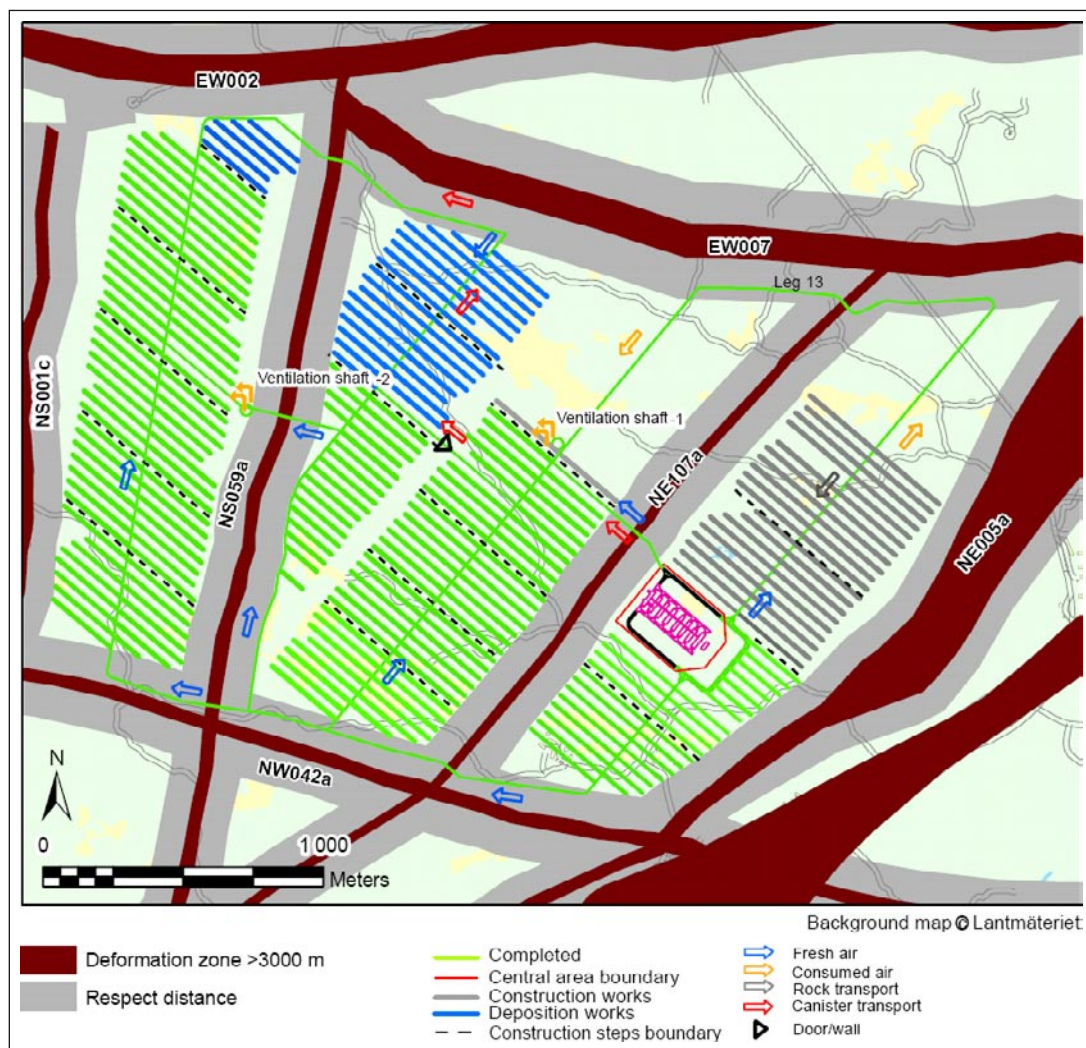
Excavation in construction steps 15 and 16 and deposition works in construction steps 13 and 14.
